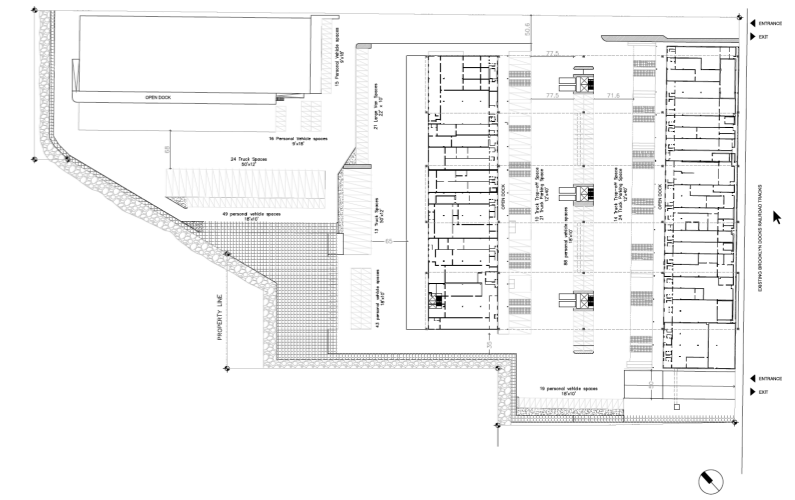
Groundfloor Plan of Adaptive Reuse Scheme
